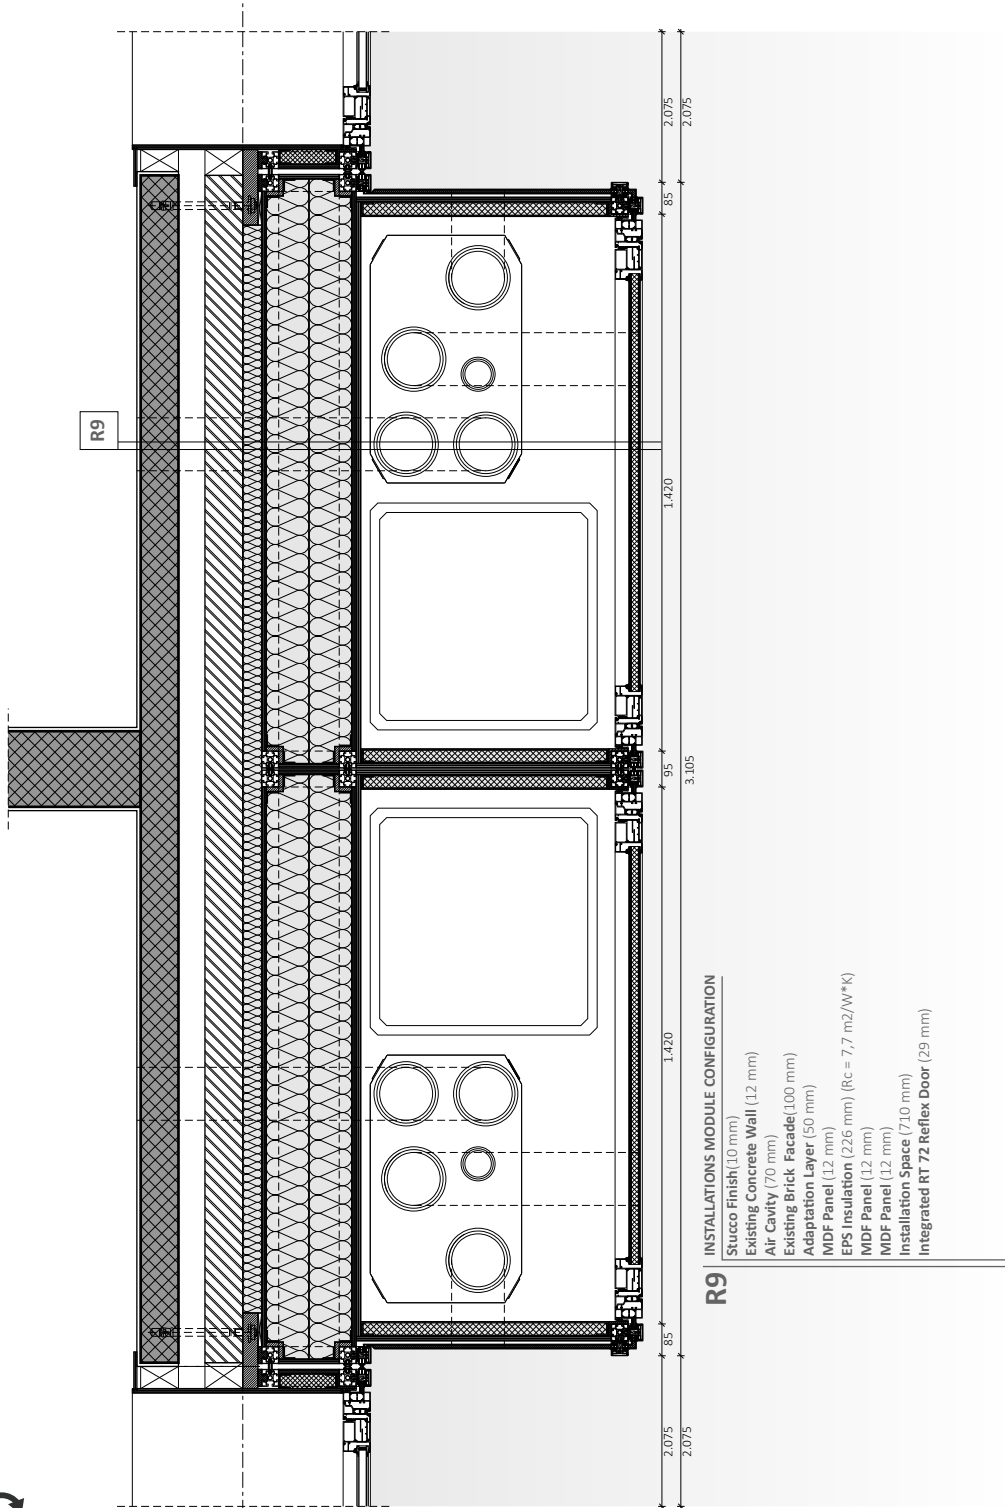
Detail | 1:20 | Horizontal | Installation Boxes (own illustration).
